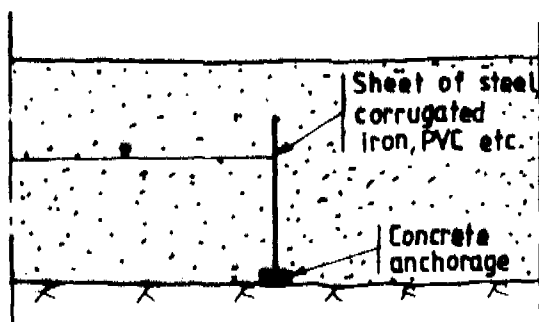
Sheets of steel, corrugated iron or PVC.
